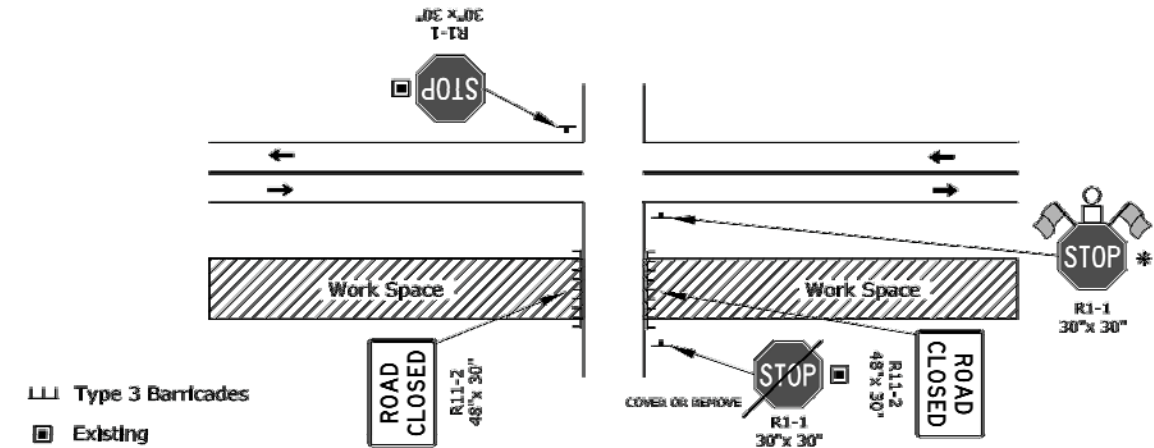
SIDE ROAD OPEN THROUGH WORK AREA ON DIVIDED ROADWAY
